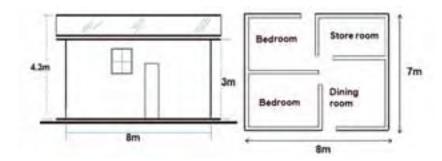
A housing unit with corrugated iron sheet roof and its floor plan.
